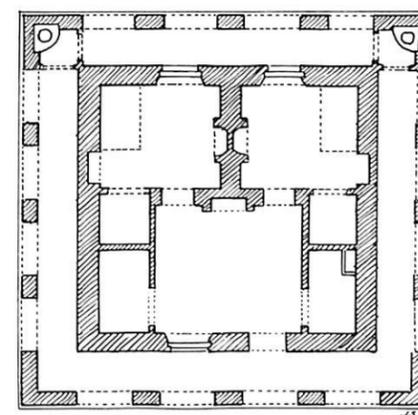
Plan of a dwelling, redrawn from London's Cottage, Farm and Village Architecture, Plate 14
